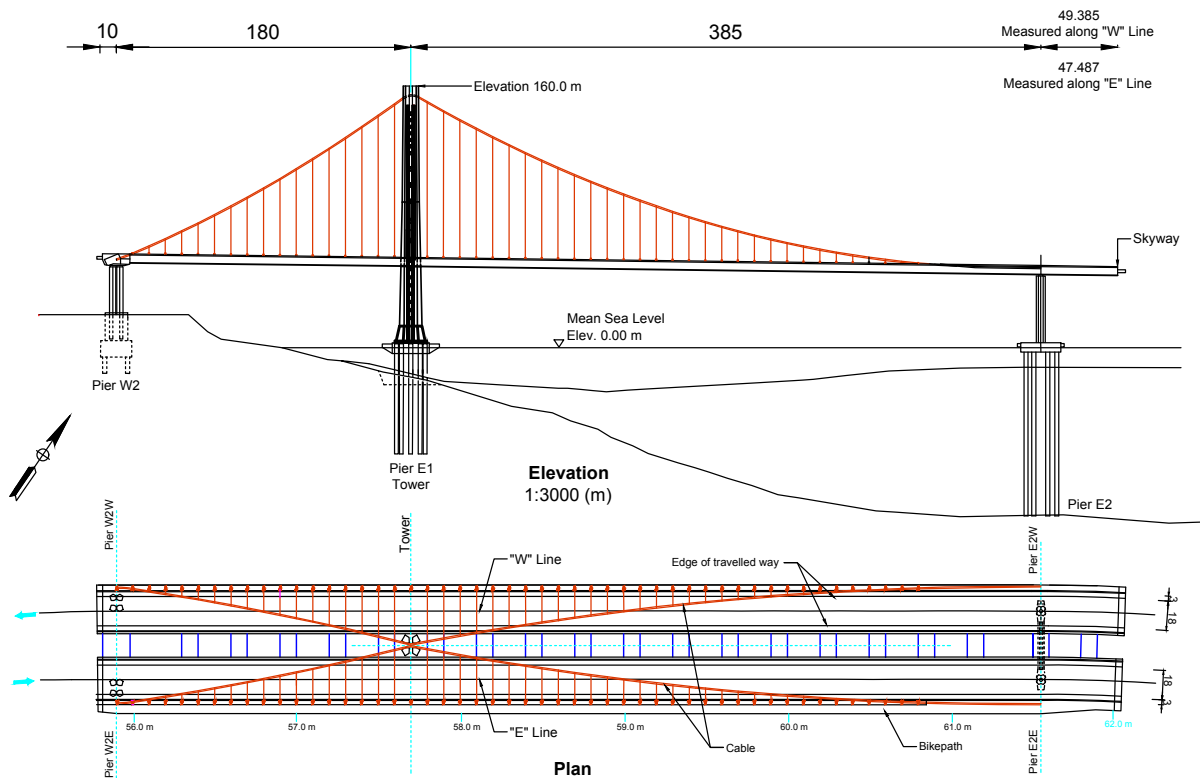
Elevation and plan of the Self-anchored span (Ref.: AutoCAD made by the author).
